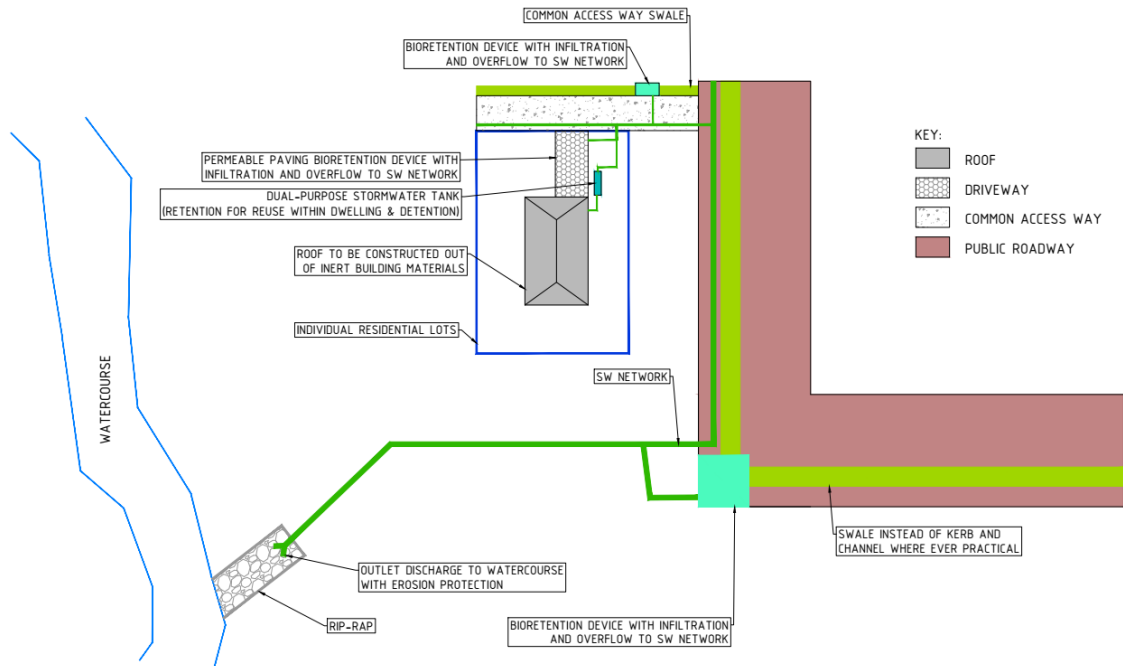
Schematic diagram of the proposed Stormwater Management Plan Option A.
